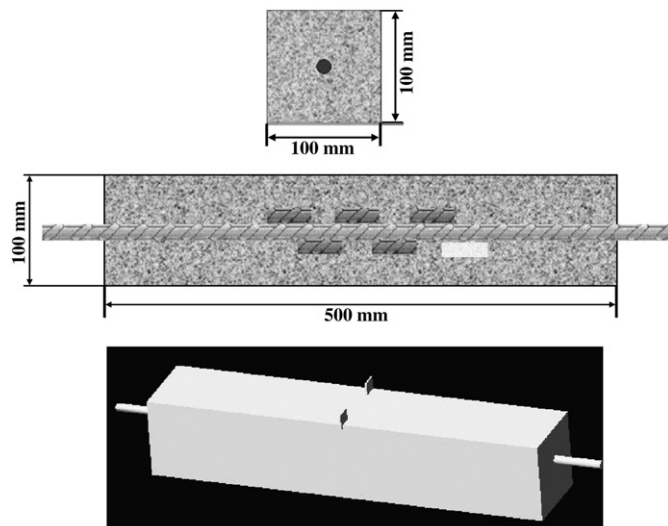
Schematic plan of the a prism with 0.1 mm induced transverse crack.
